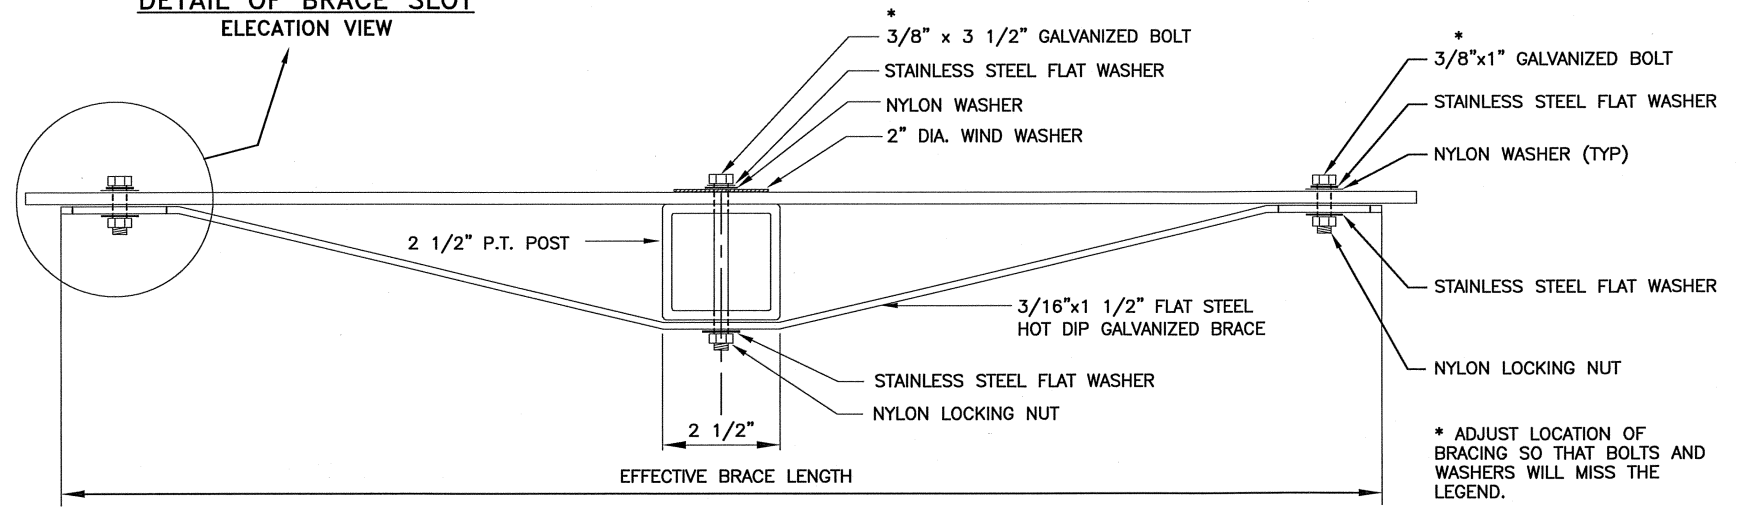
DETAIL OF BRACE SLOT ELEVATION VIEW
